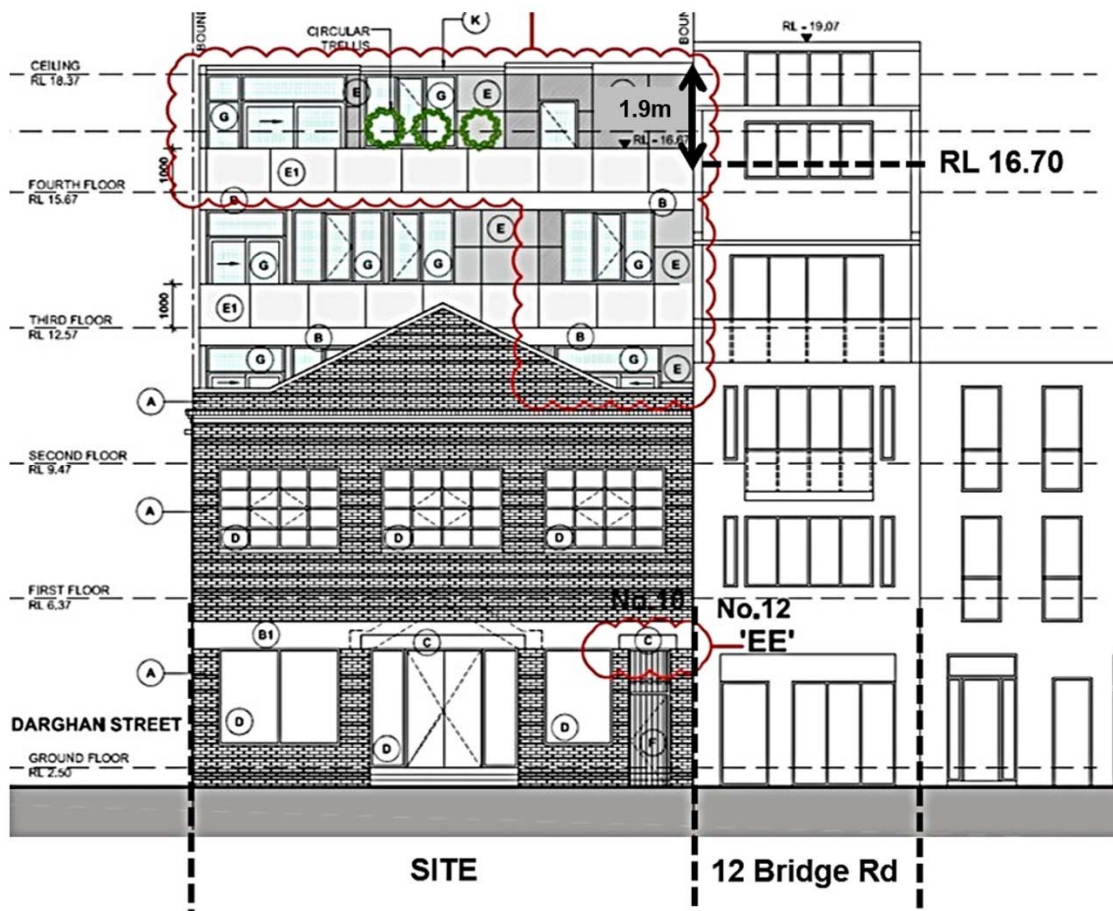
Bridge Road elevation showing relationship of proposed development to the balcony of the level 5 apartment at 12 Bridge Road.
